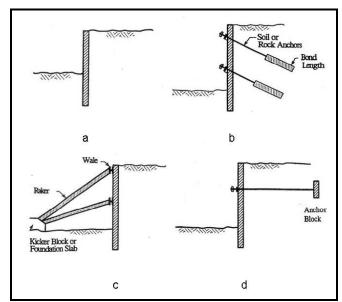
, Wall Support Systems (Modified from Earth Retaining Structures – June 2008)
